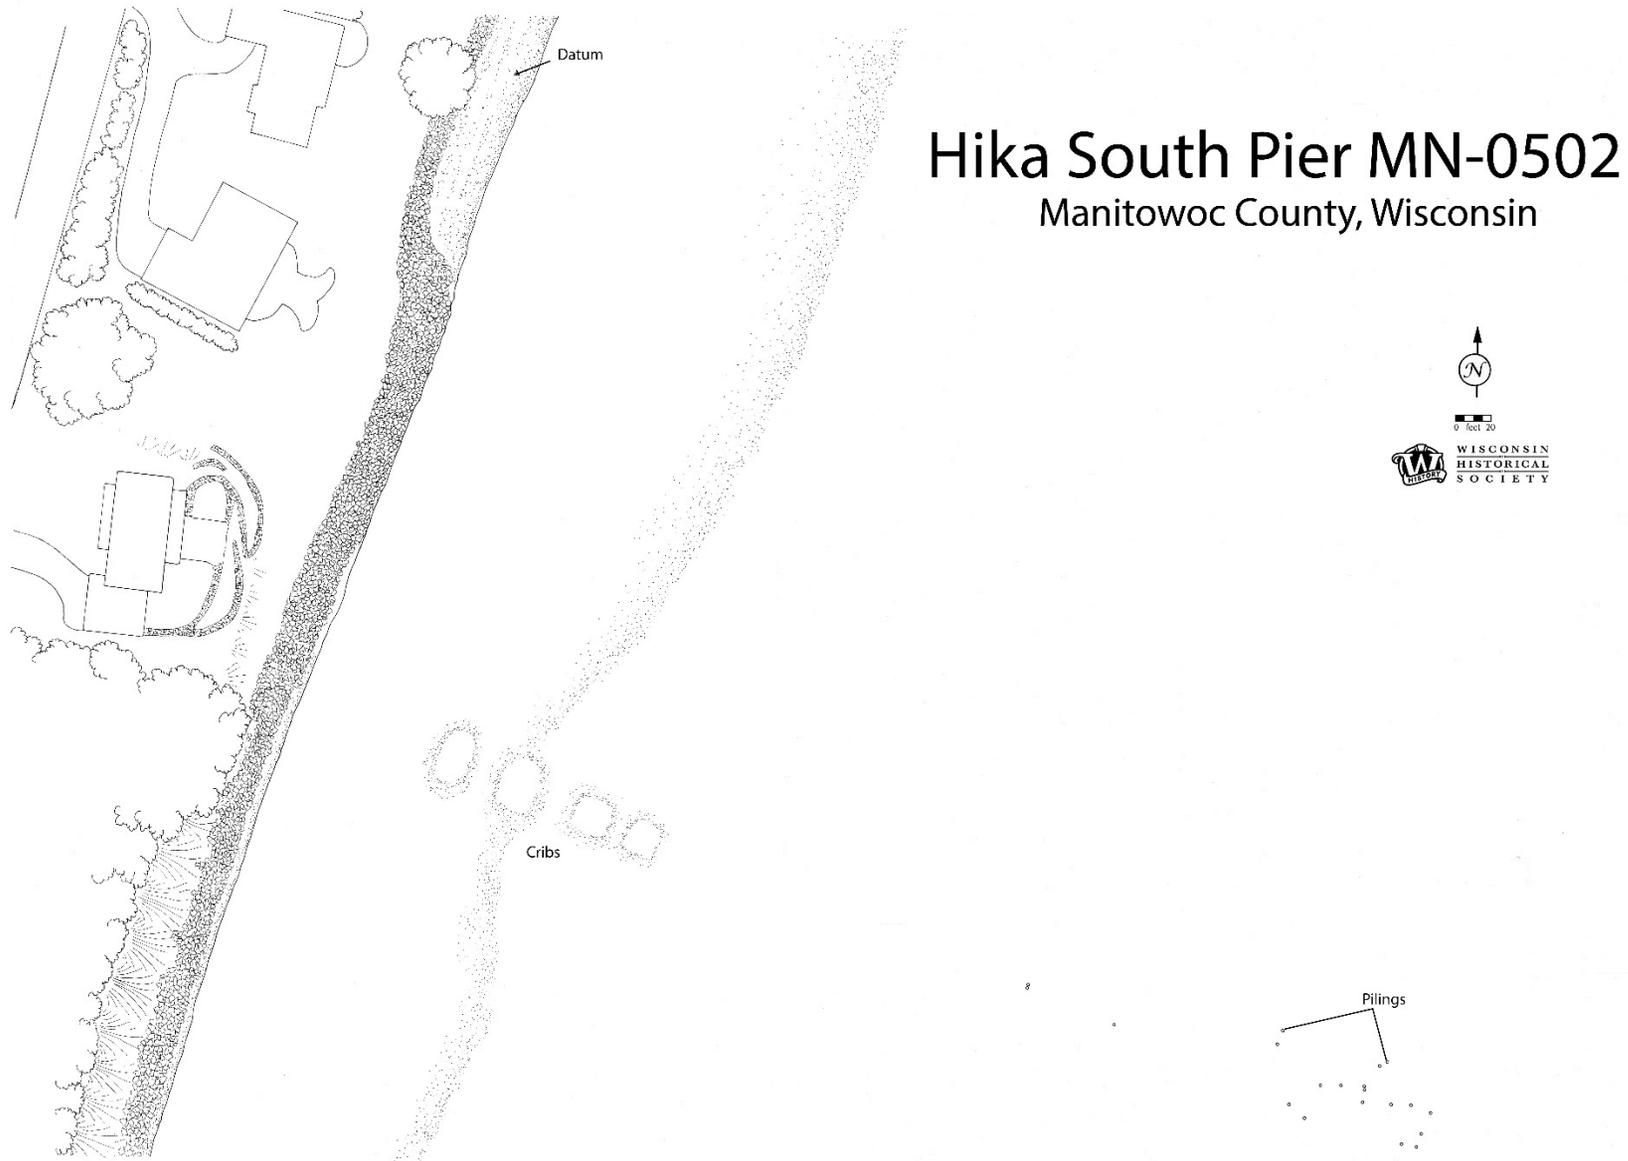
Centerville South Pier Site Plan (Wisconsin Historical Society)
